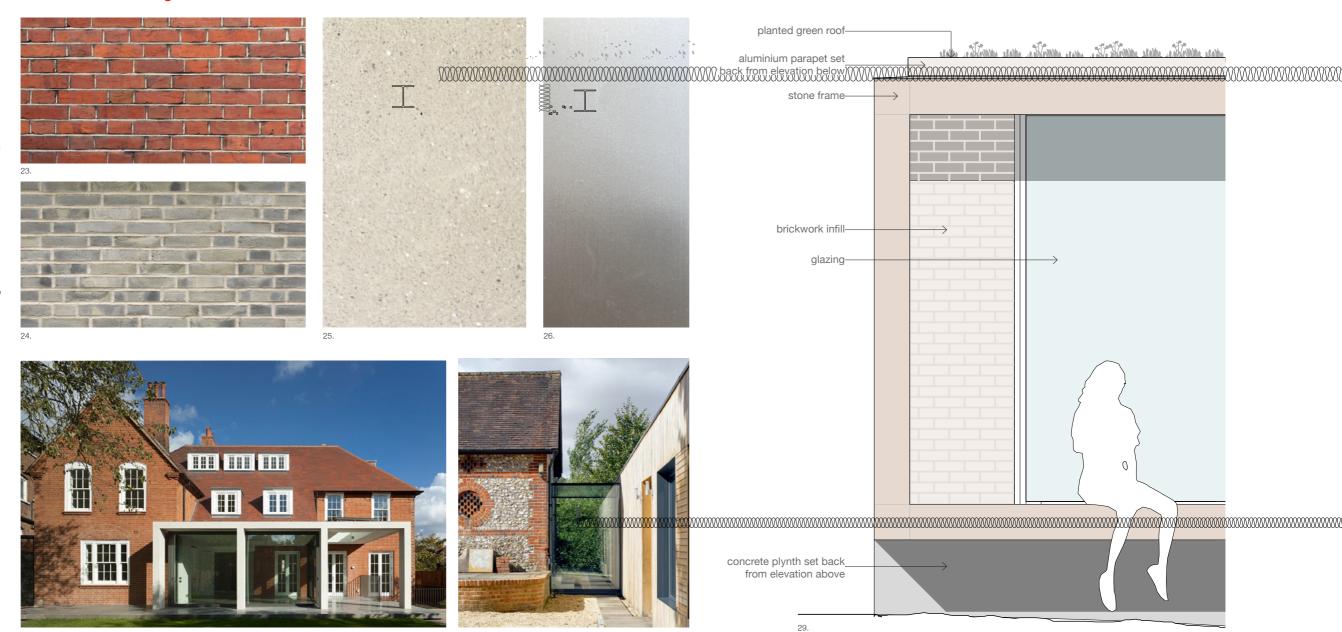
Example of stone to be used for cladding to frame of extension, colours and texture to complement existing brickwork
